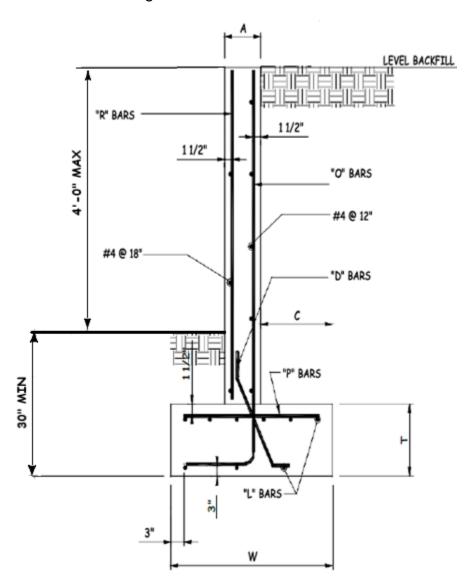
TYPICAL REINFORCED CONCRETE WALL SECTION
